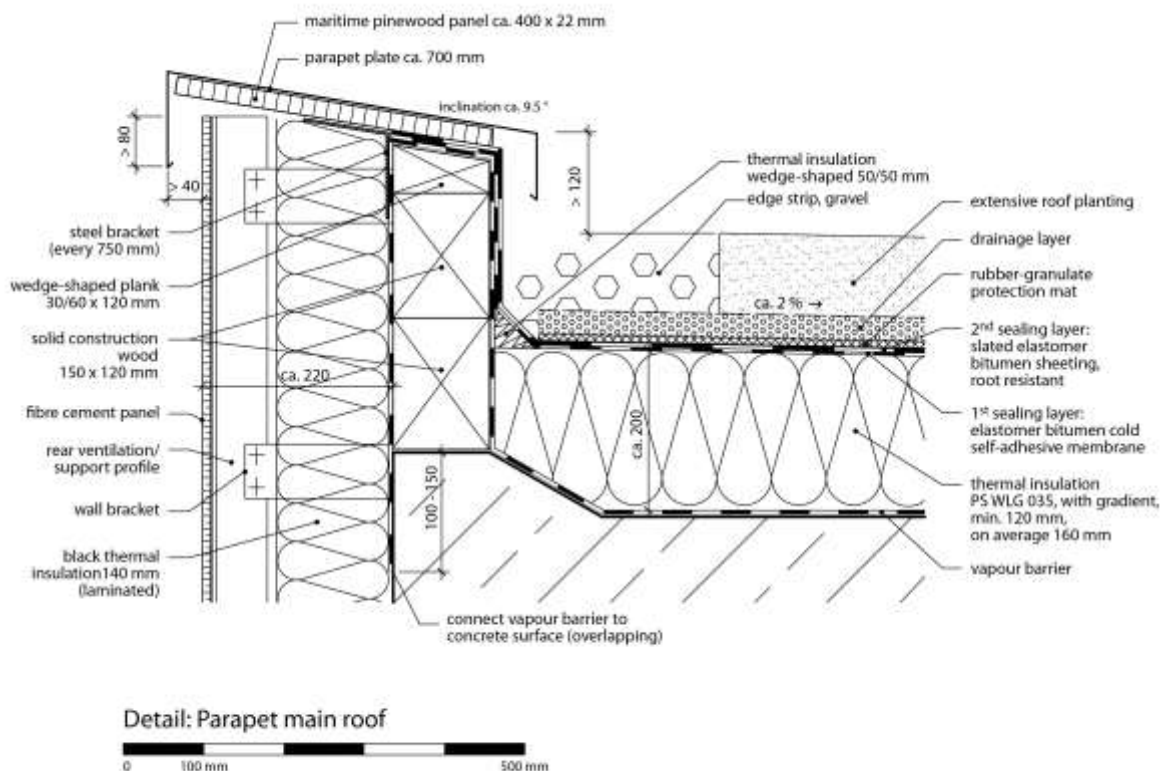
Architectural/principle drawing of the retrofitted roof of the big pavilion that includes the construction of the new parapet.
